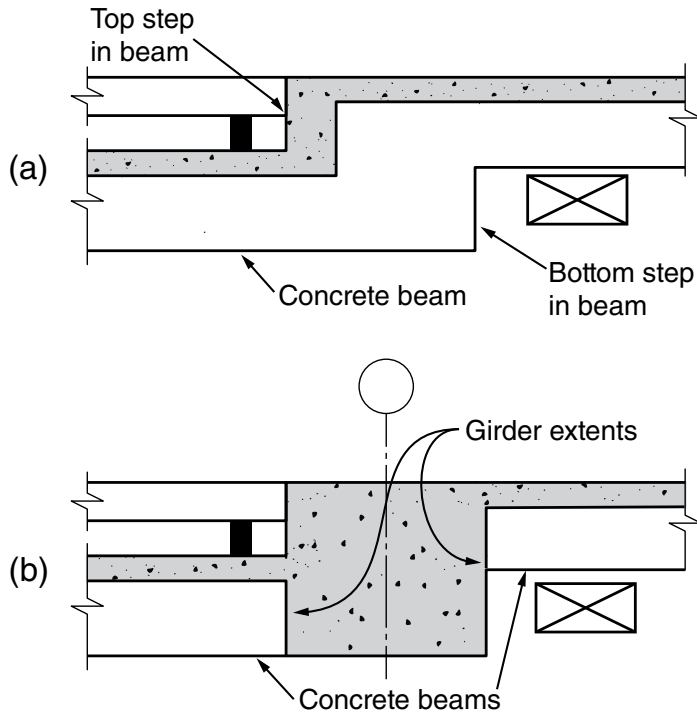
Deep transitions in slab elevations: (a) equal transition depths should be provided for the top and soffit elevations; and (b) transitions should be located at the side of a beam or girder.
